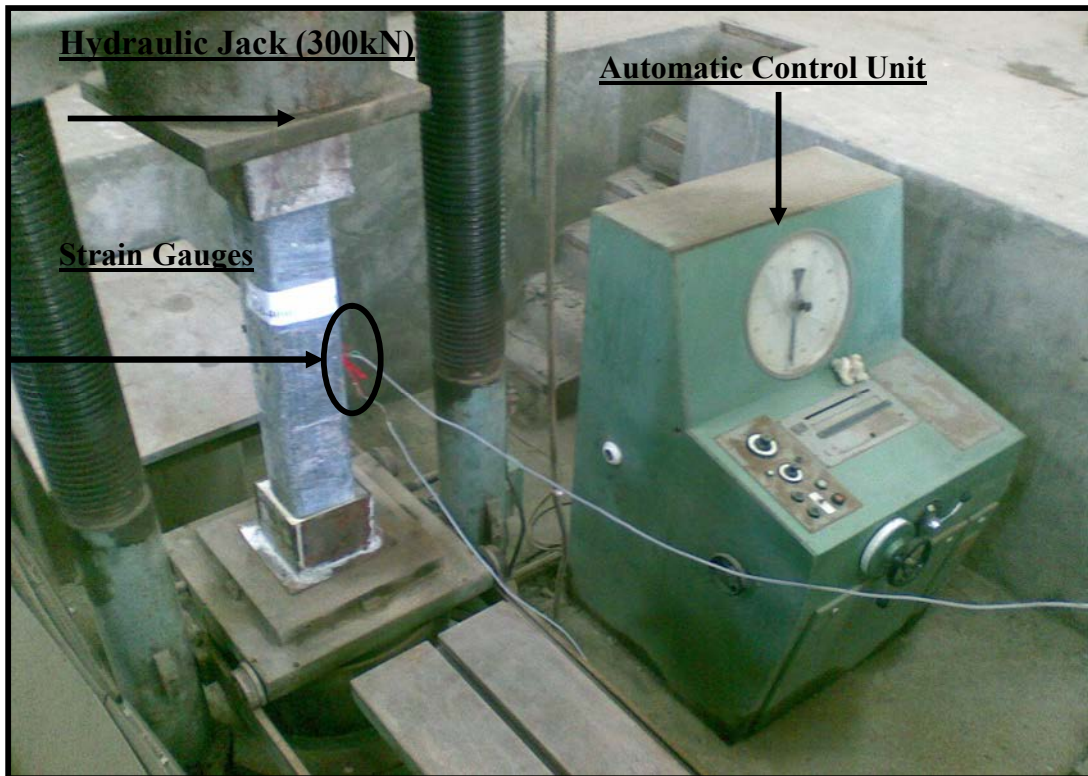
Universal Testing Machine and the Specimen while testing
